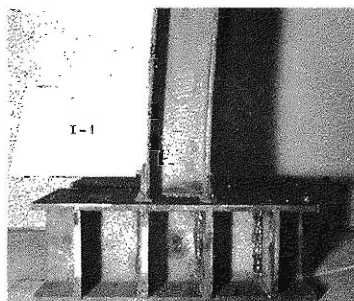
Permanent Deformation at Column End (on the more severely compressed side).
